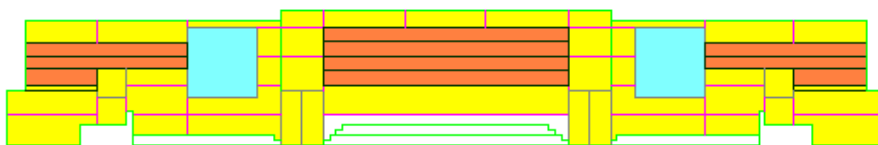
Rear wall elevation. Inclined walls are brown, vertical planes yellow and windows blue.
